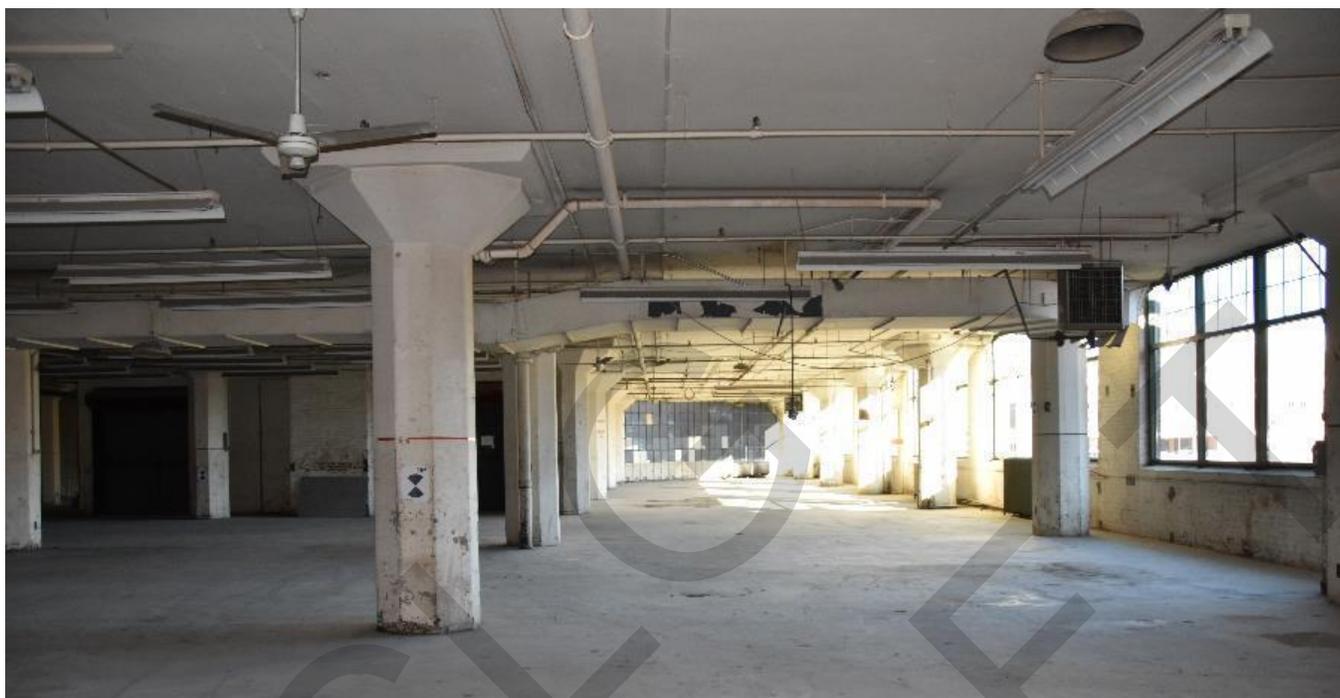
Ford Motor Company Assembly Plant, Second floor interior
